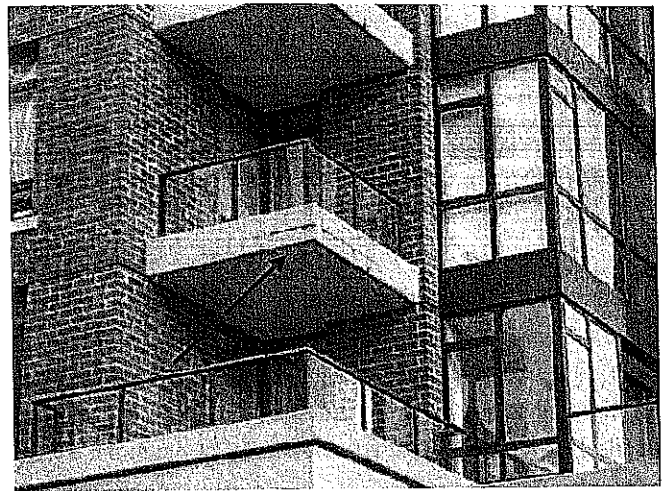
Northeast corner at level 3. There is water staining at the cold joint between the concrete structural slab and perimeter curb.
